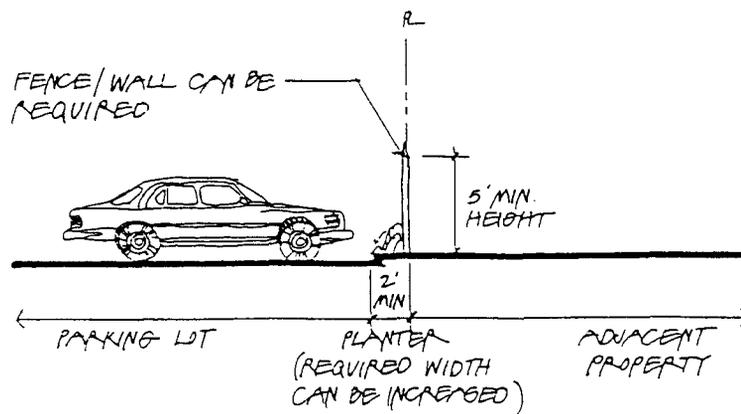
Parking Lot Edge Condition - Fence or Wall
